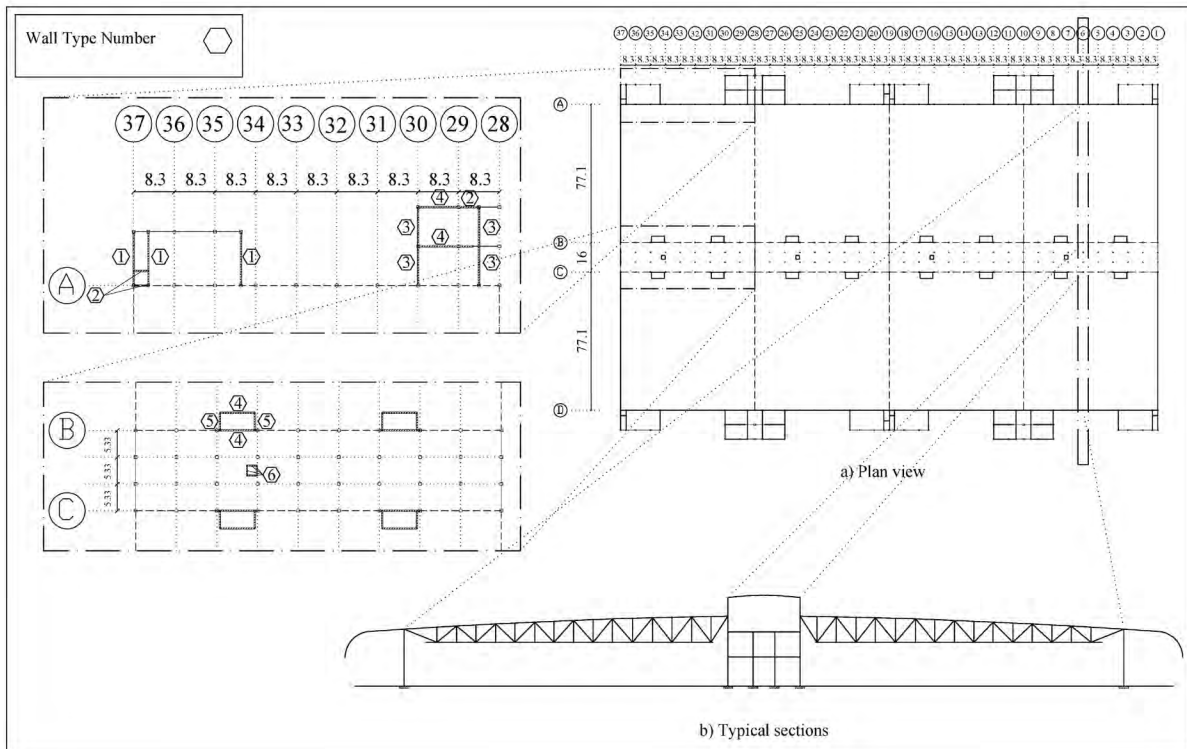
Plan and section view of the Typical Hall Building, including shear walls, beams, and columns.
